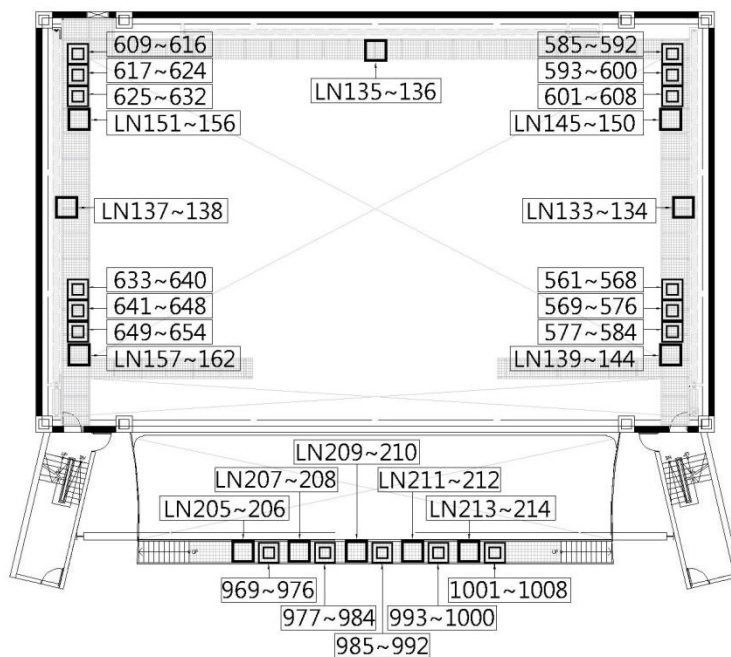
Orchestra Pit Overhead and R1F Gallery Lighting Circuit Layout
